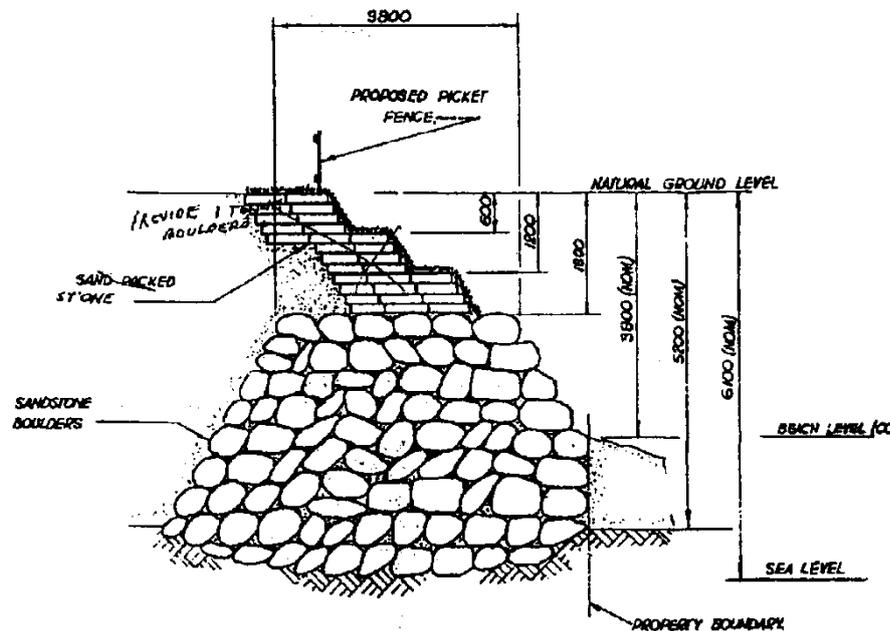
1978 design drawing for 23 Surfview Road revetment from WRL (1999), note upper section as drawn has hand written notes showing this was deleted and replaced by boulders
